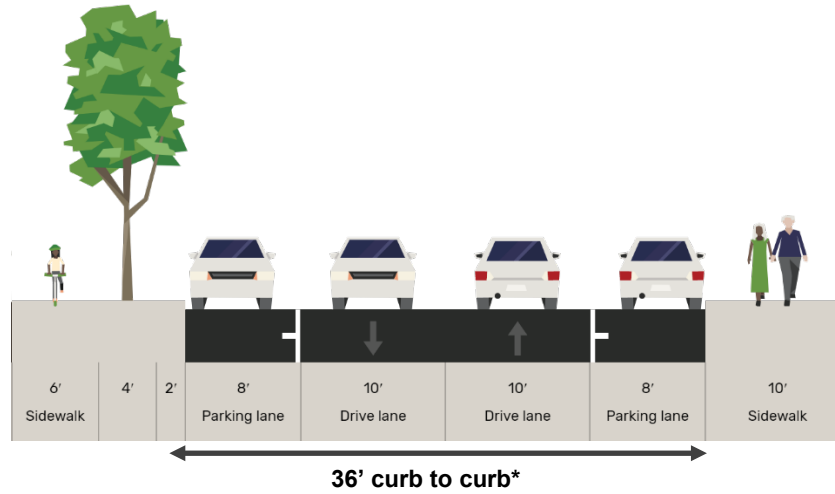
Section A (Butler Street - 57th Street to Sawyer Street) – Existing
